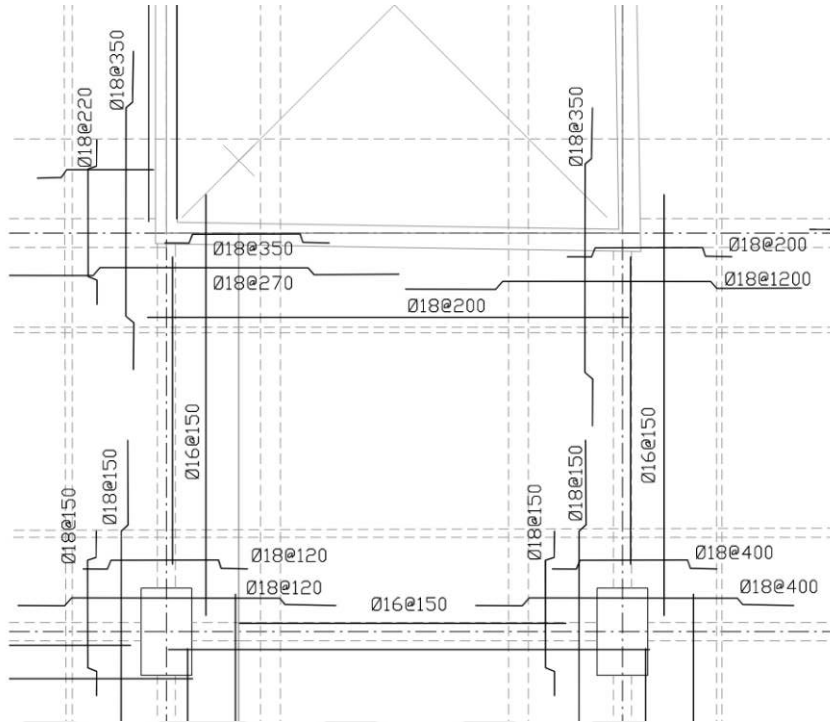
Column Strip Steel Reinforcement for Panel (8.3x7.5) of Flat Floor (8.3-7.5-7.2).
